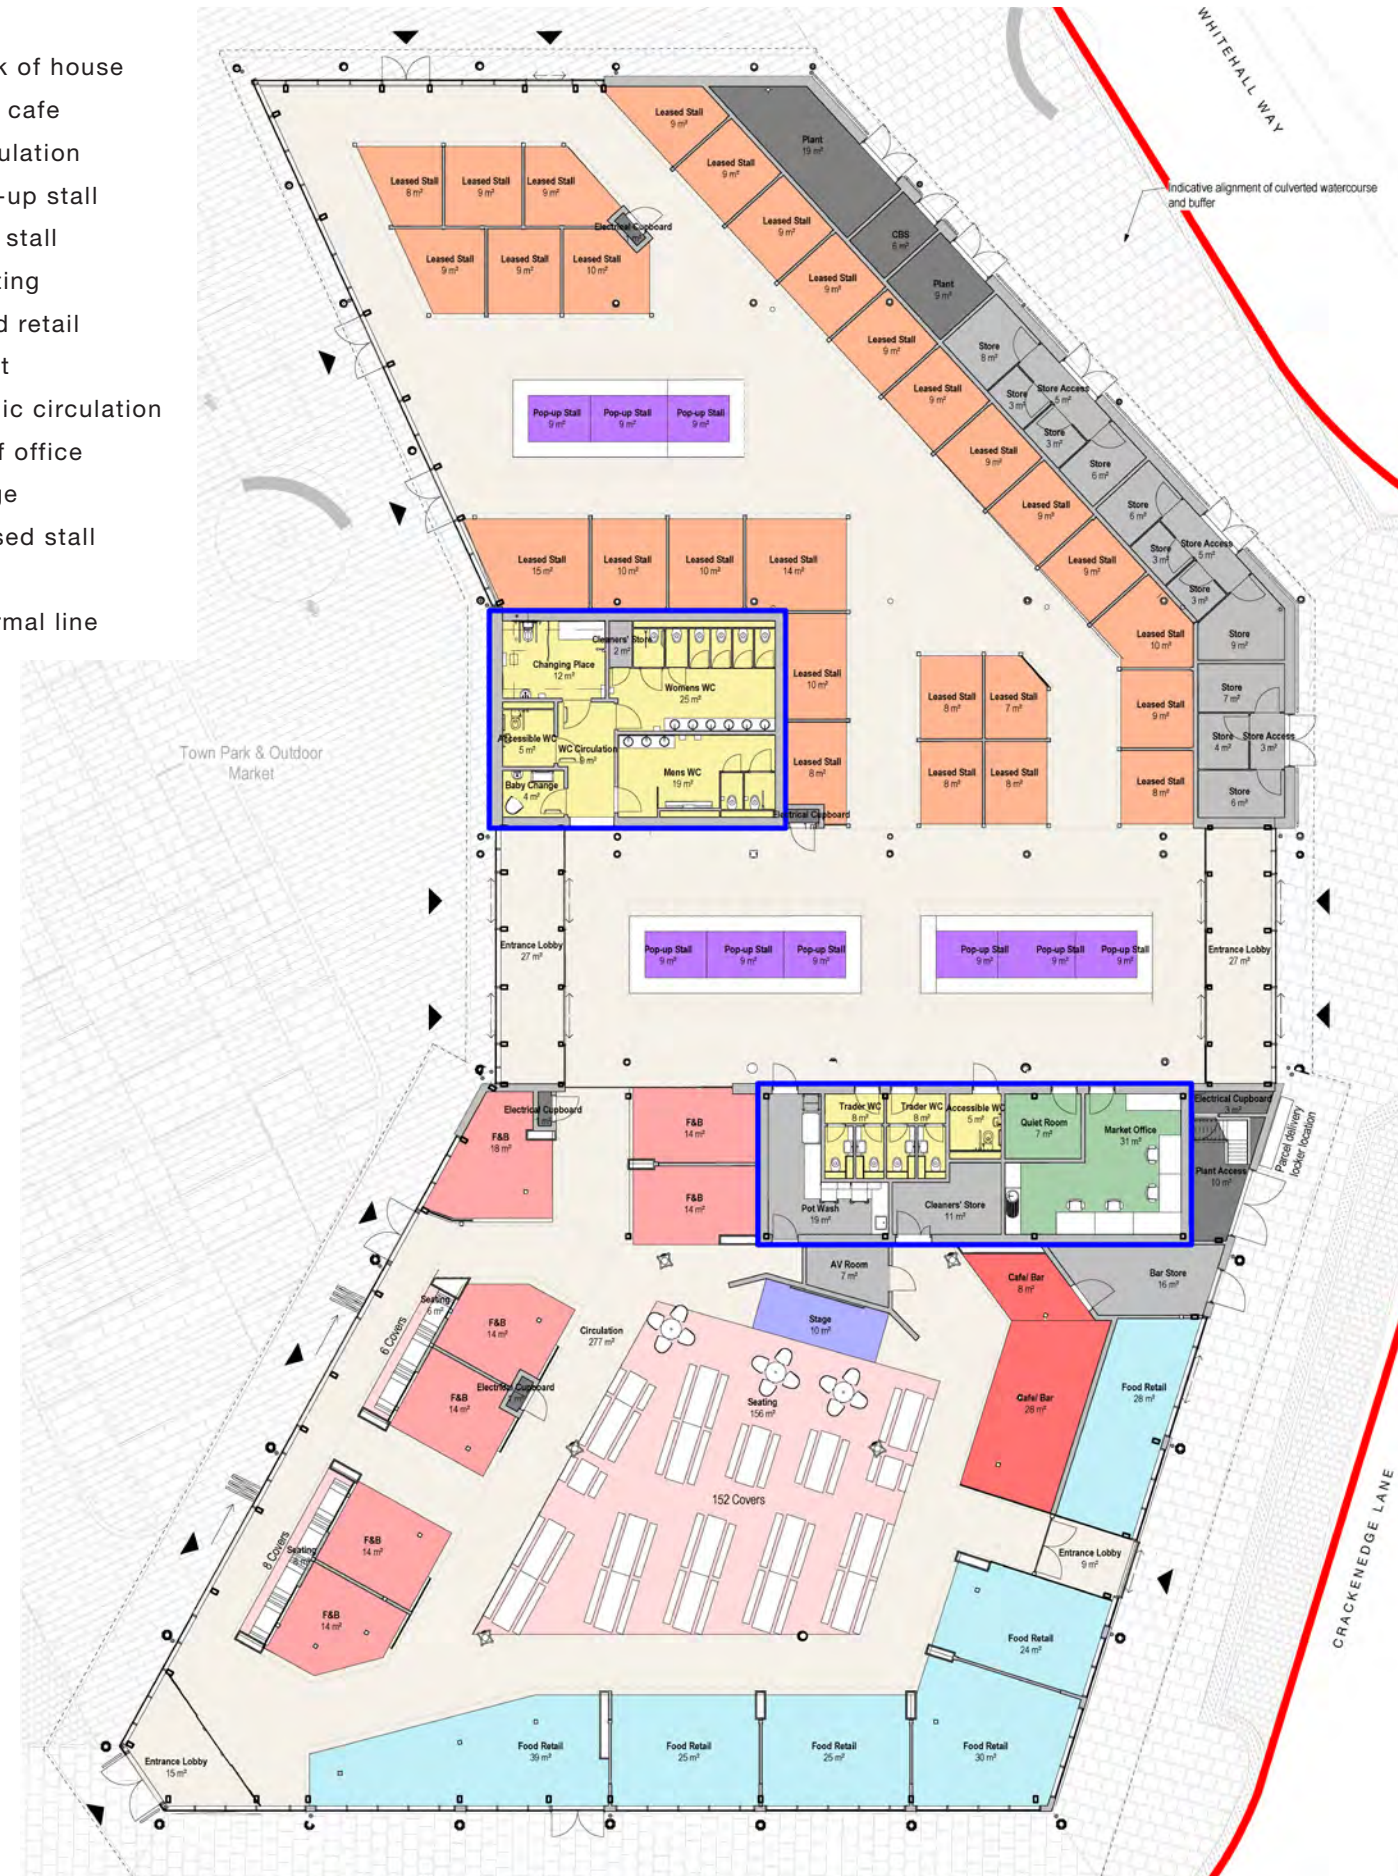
Market Buildings Proposed Layout (nts)
